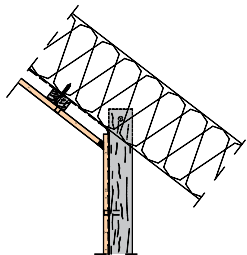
Junction of a sloping roof with wall under the sloping roof. Ensure any battens on the ceiling or the wall are a maximum of 100 mm from the board edge. Tightly butt the fermacell boards at the junction to finish the joint. It can be filled using a flexible decorators filler.
